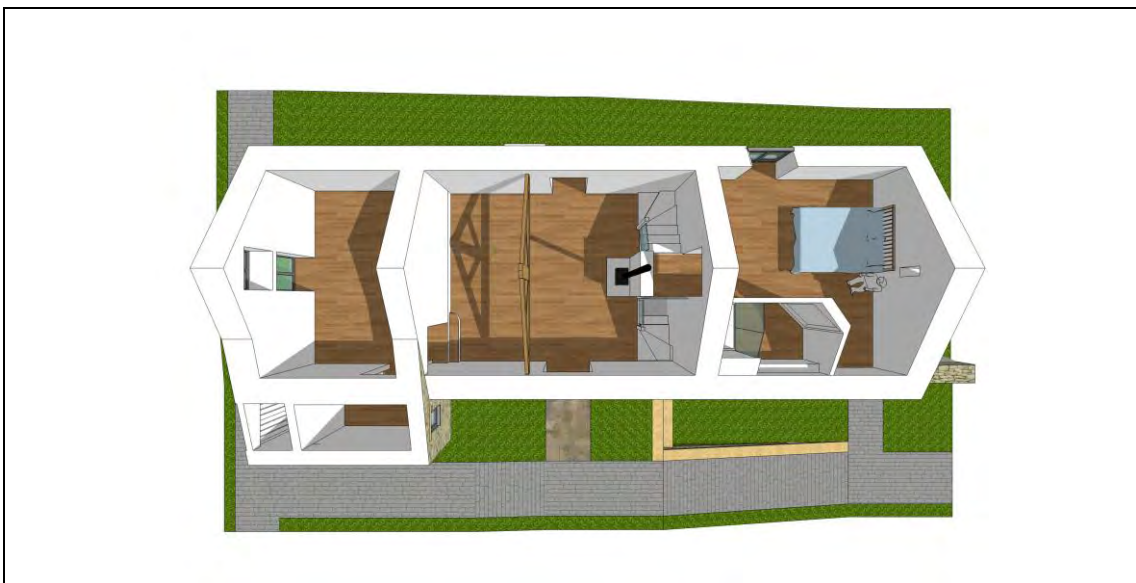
PLAN VIEW FROM ABOVE, SHOWING FIRST FLOOR TO NORTH BAY
